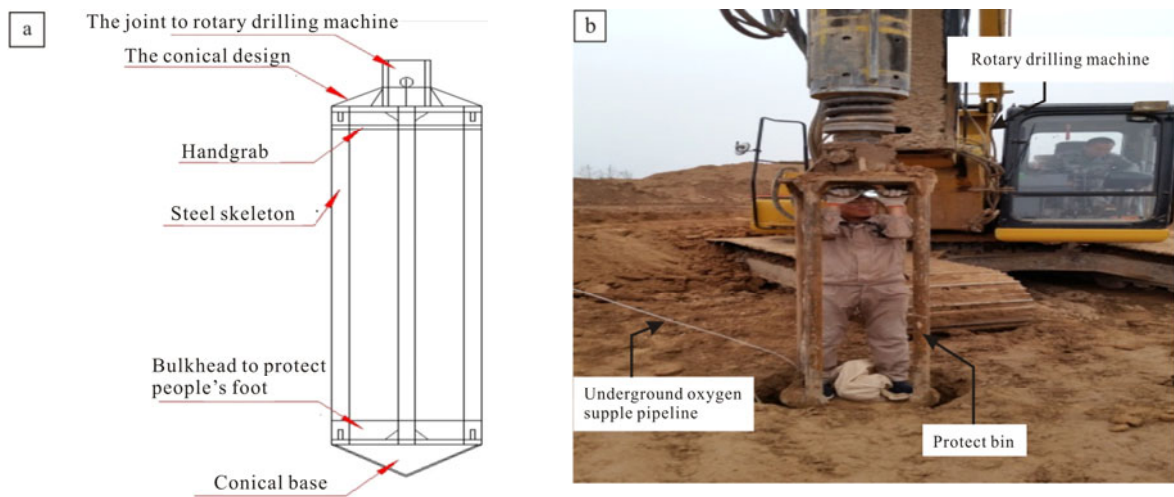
Installation of underground instruments: (a) design of the protect bin; (b) the process of installation.
